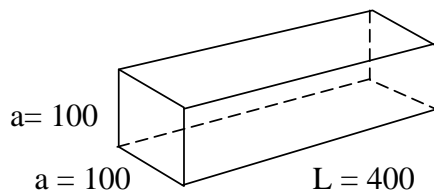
Dimension and shape of the concrete specimen at moist related tests
